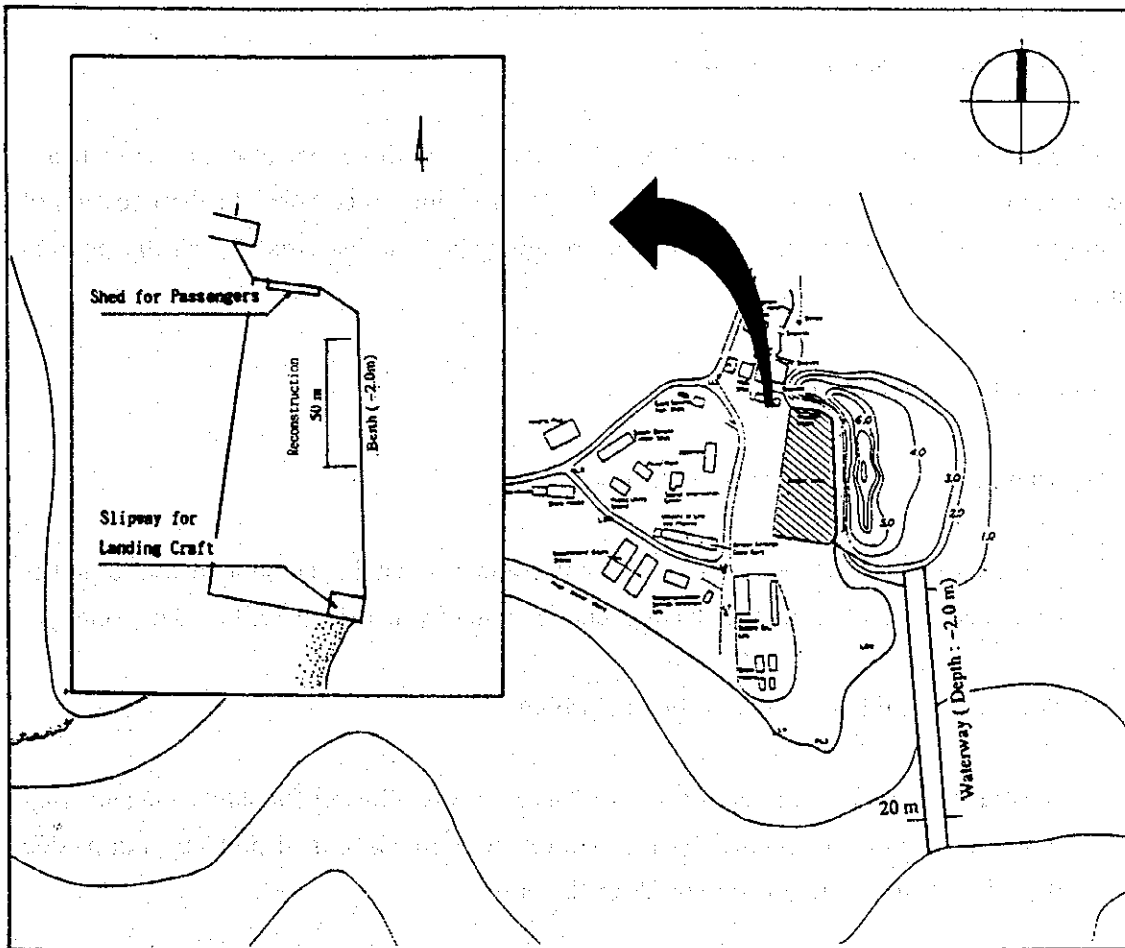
Conceptual Plan of London Wharf, Alternative Plan 3
